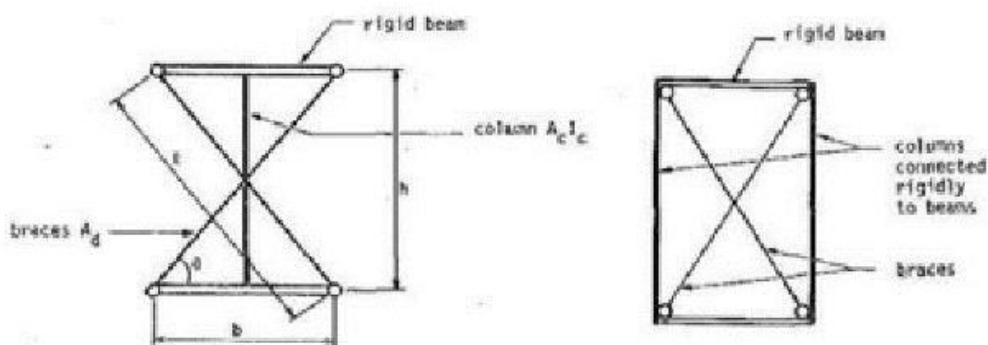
a) Braced Wide Column Analogy, b) Braced Frame Analogy
